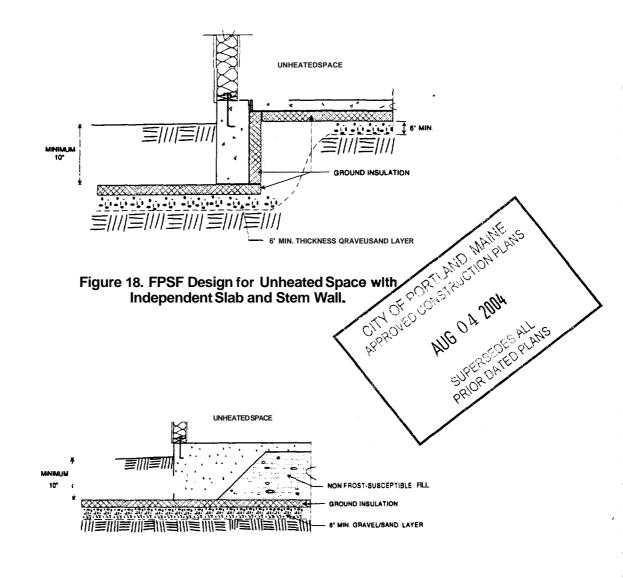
FPSF Design for Unheated Buildings with Insulation in Single Plane.
